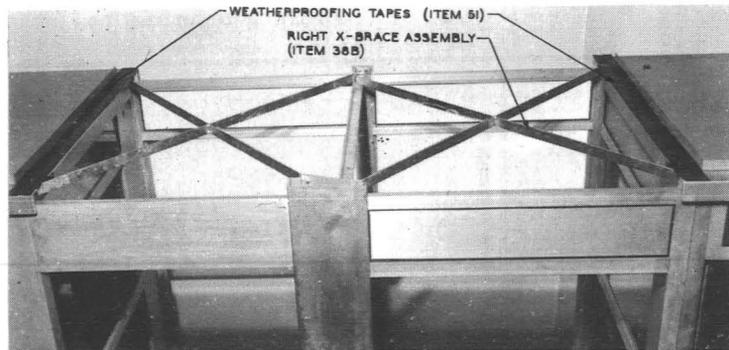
LEFT AND RIGHT BRACE ASSEMBLY
